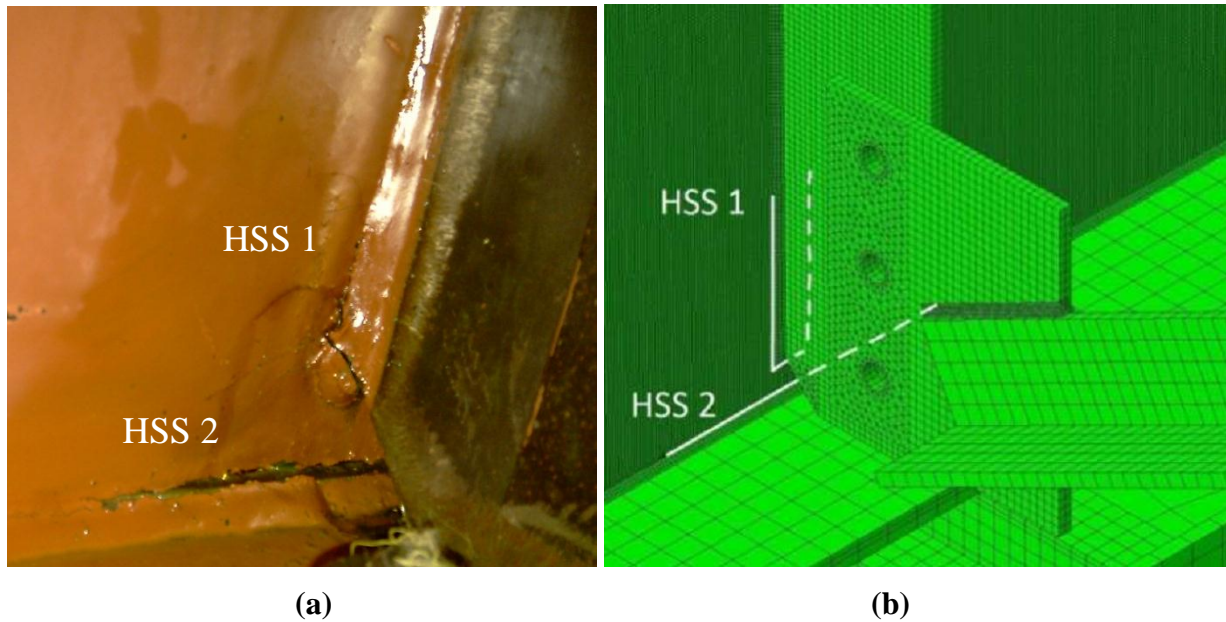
(a) Cracks on the experimental girder subassembly and (b) cracks modeled in the finite element model of the subassembly
